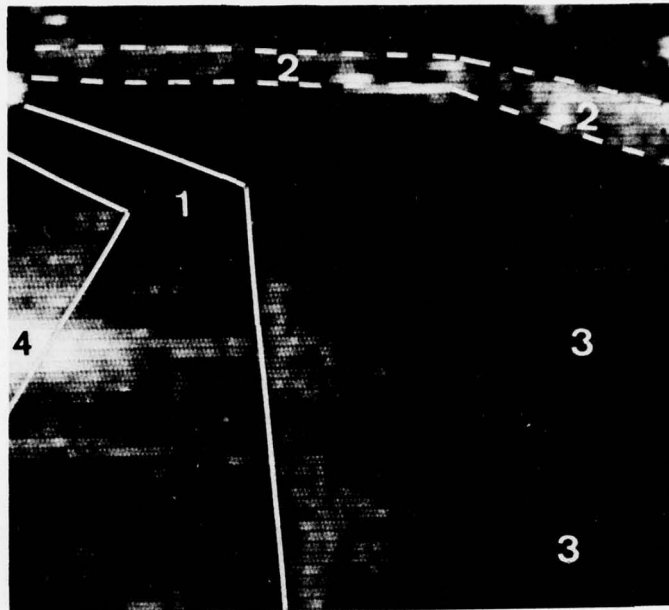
Thermogram showing mottled appearance of the State House Annex roof (1 – walkway, 2 – parapet, 3 – patches of ice, 4 – heat from exhaust fan).
